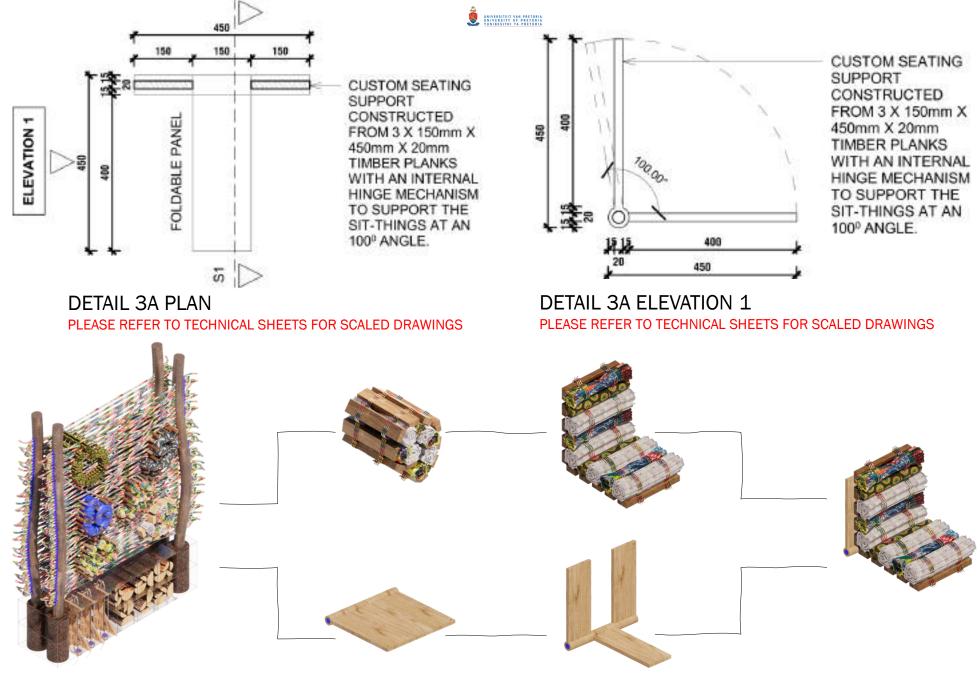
ELEVATION 1 PLEASE REFER TO TECHNICAL SHEETS FOR SCALED DRAWINGS
